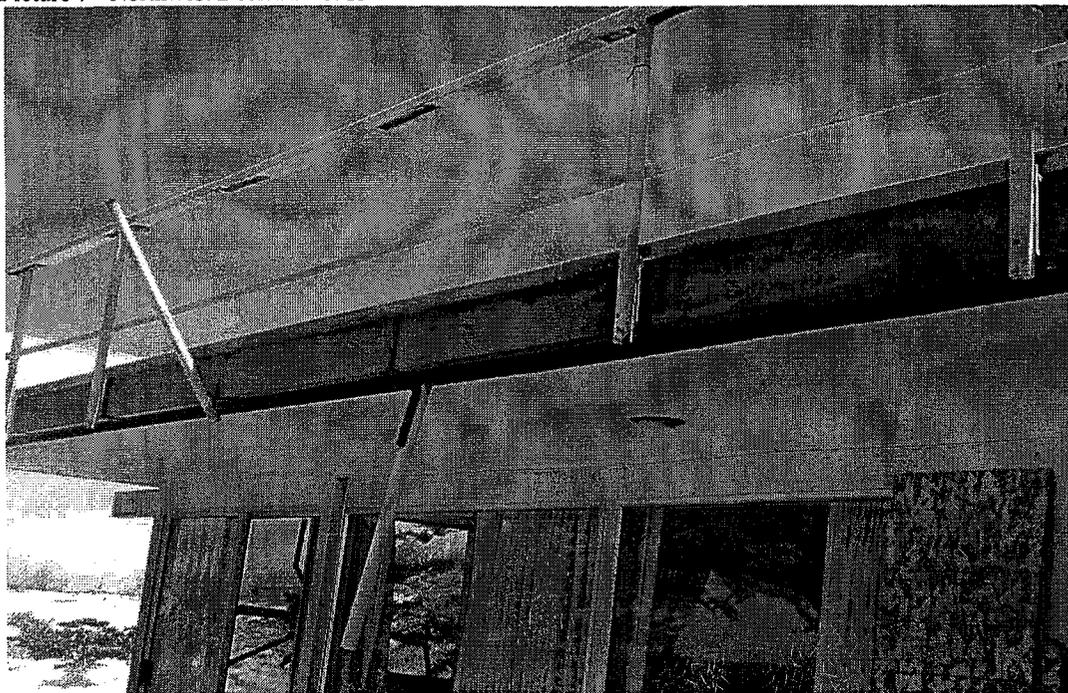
Replaced Windows Damaged - Living Room Courtyard 9/13
